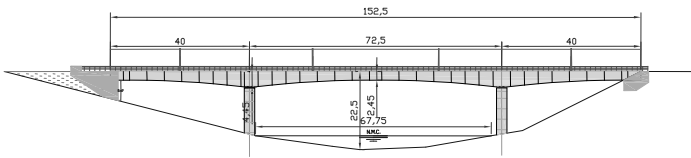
Balanced cantilever bridge longitudinal layout. The vertical lines define a new constructional segment
